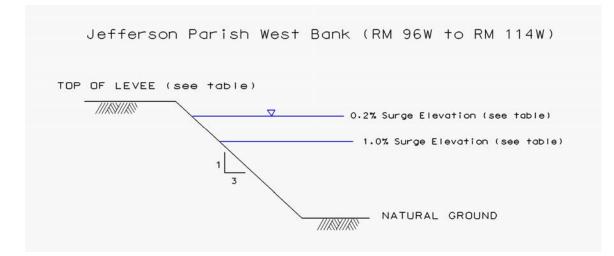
Typical Levee Design Cross-section for Wave Force (RM 96W-RM 114W) – Jefferson Parish West Bank
